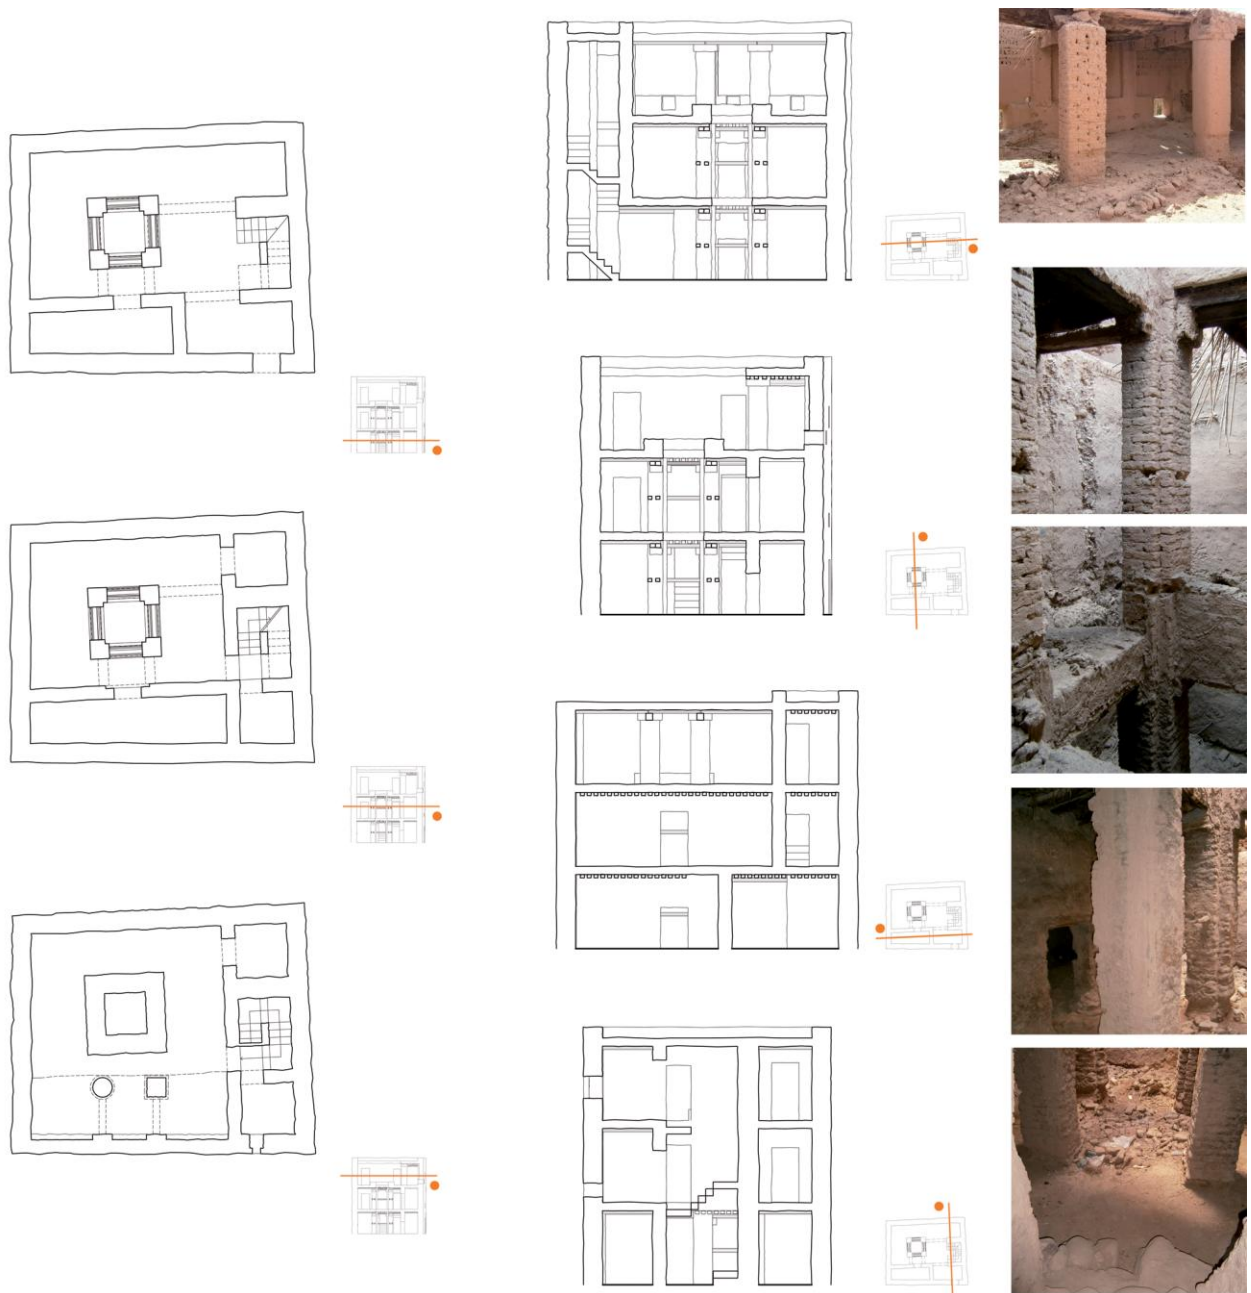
Earthen House in the Ksar of Do Mougni. Plan and section.
